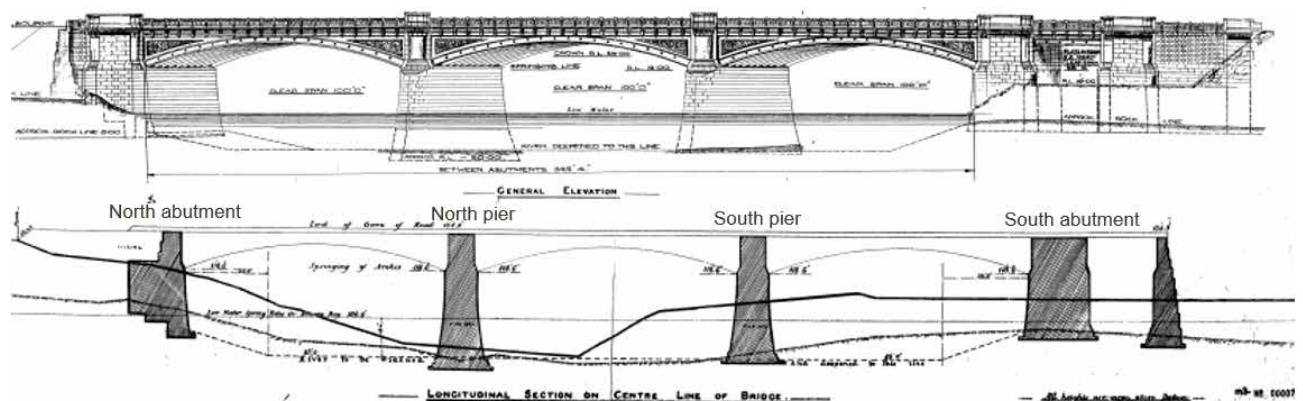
General Elevation and Longitudinal Section through Princes Bridge
